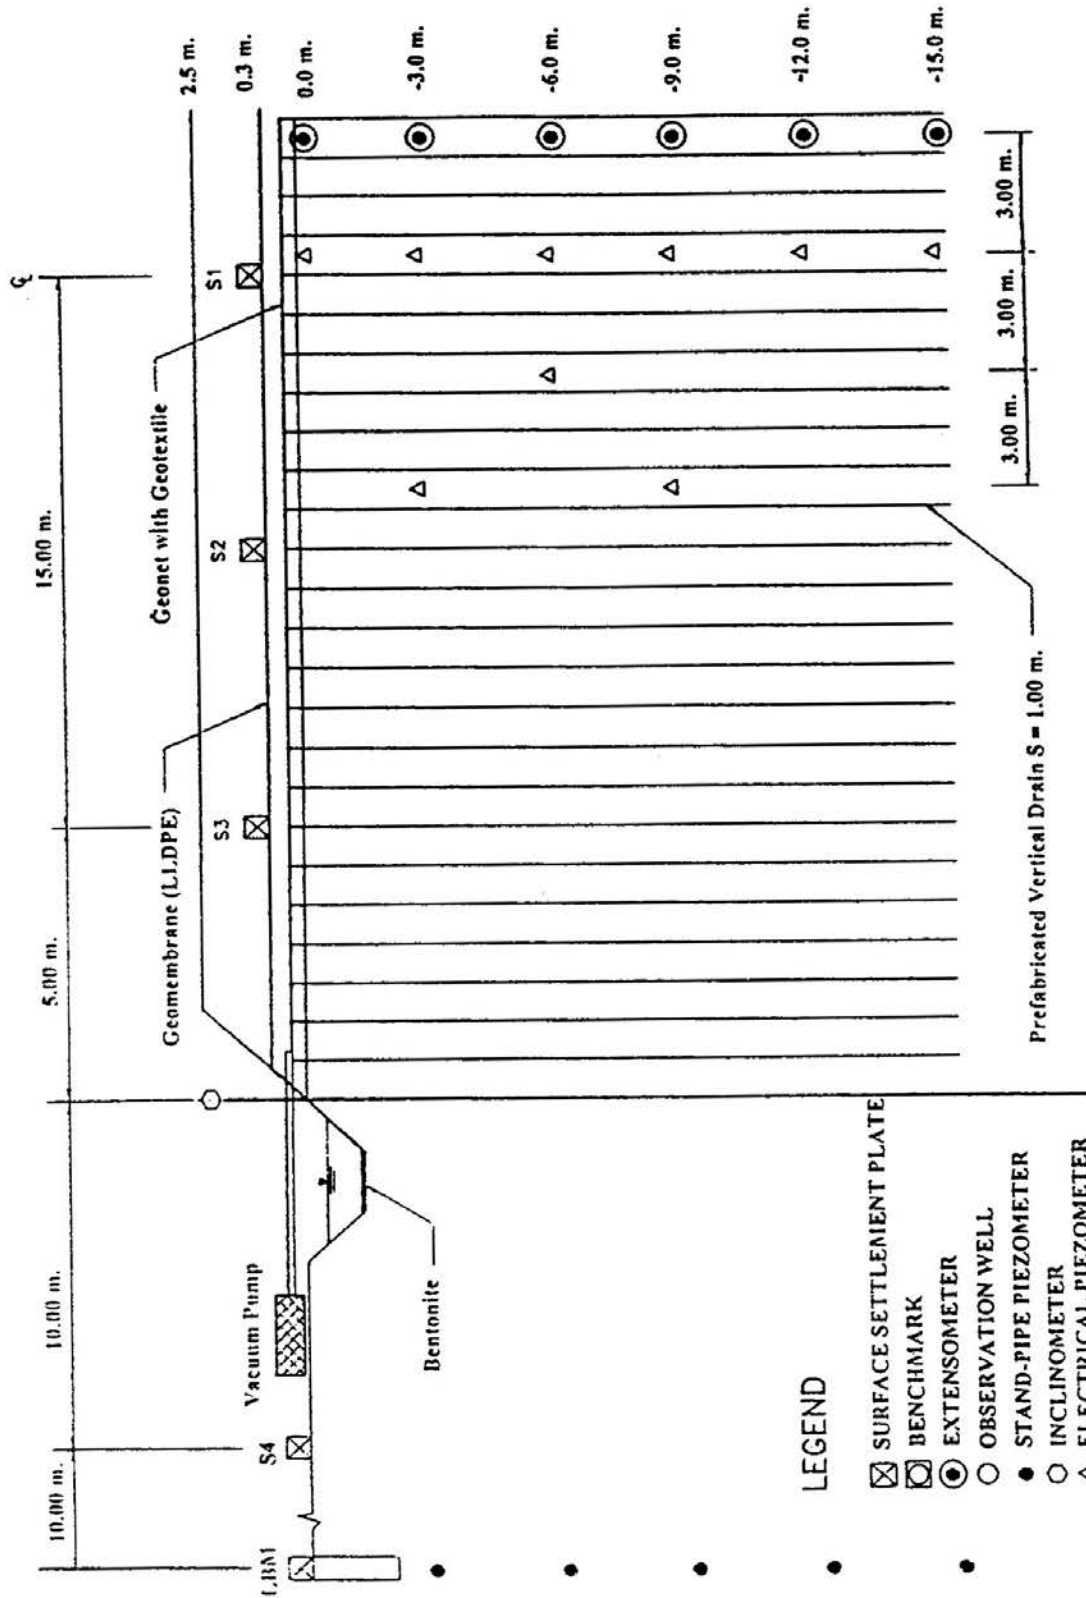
Cross-Section of Embankment 1 with 15.0 m Long PVD and Locations of Monitoring Instrumentations
